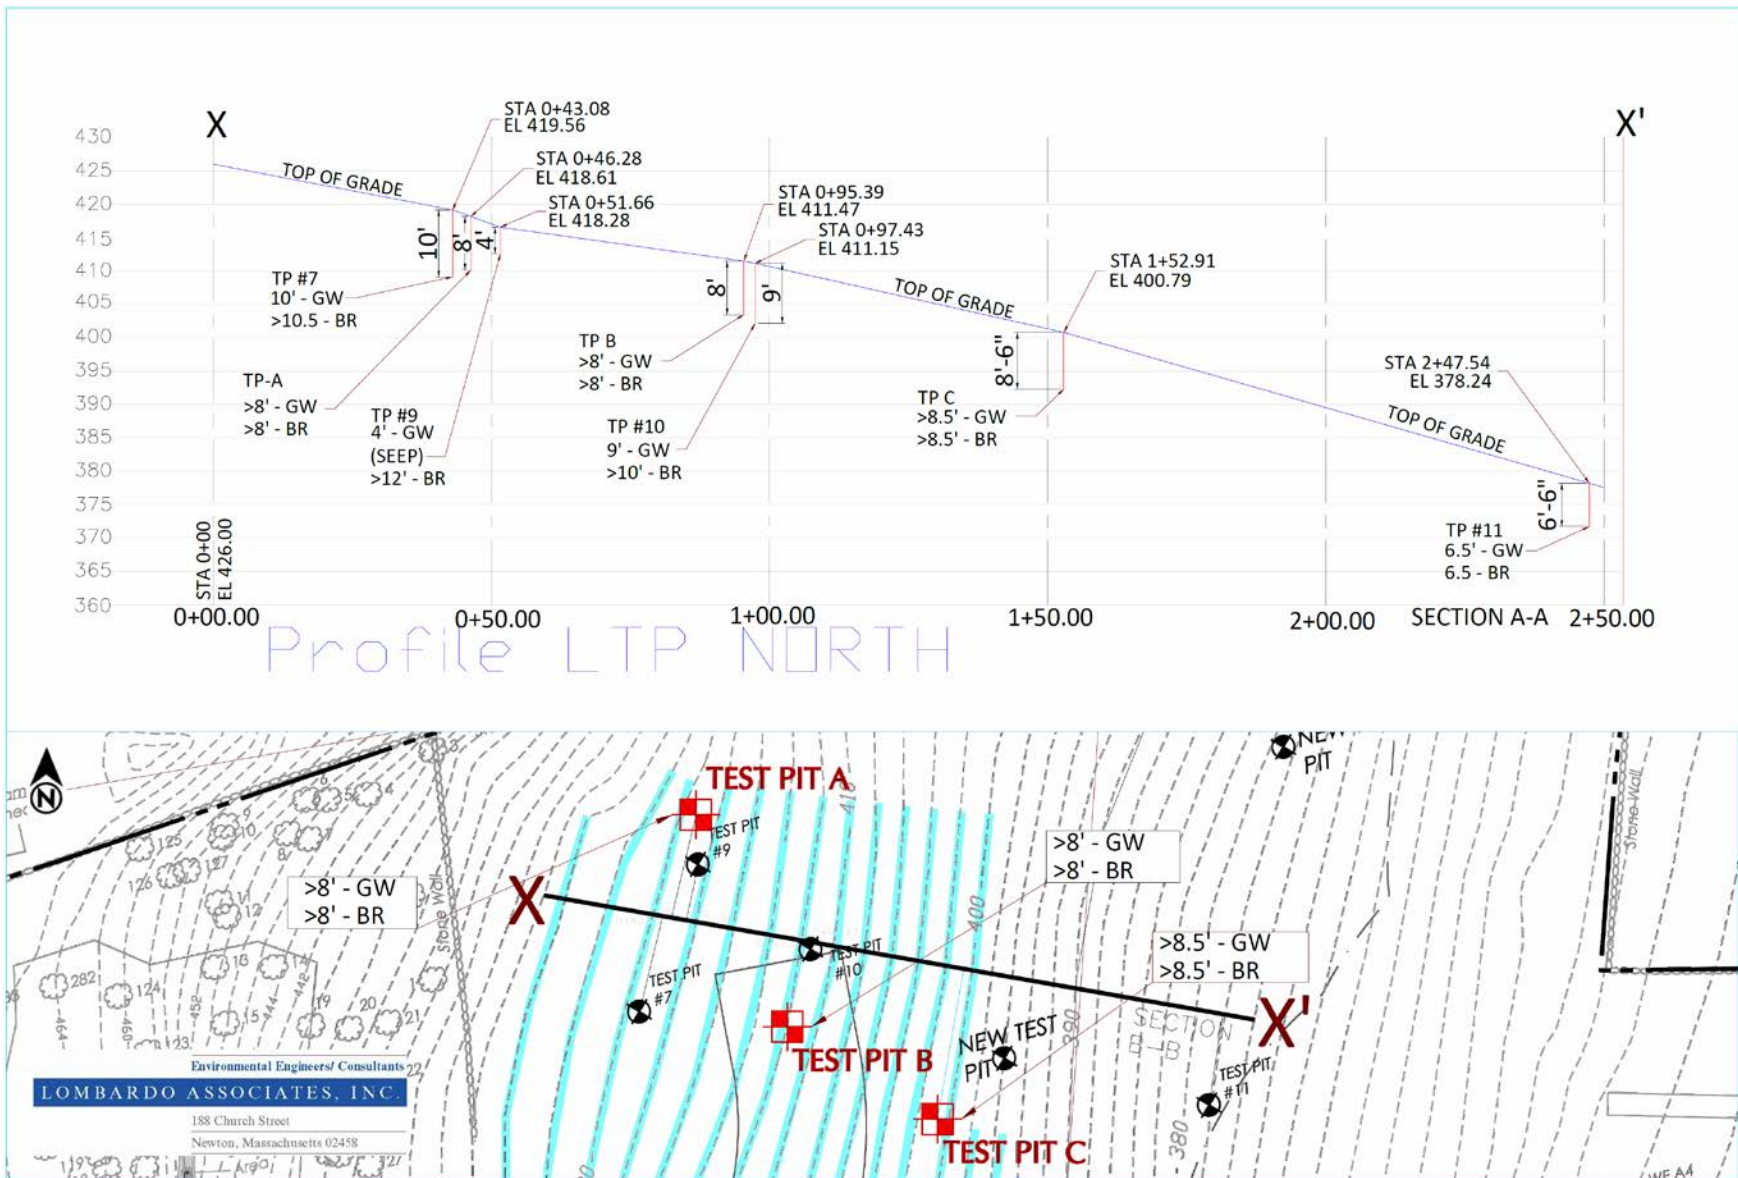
Lower Trinity Pass, North Test Pits Cross-Section
